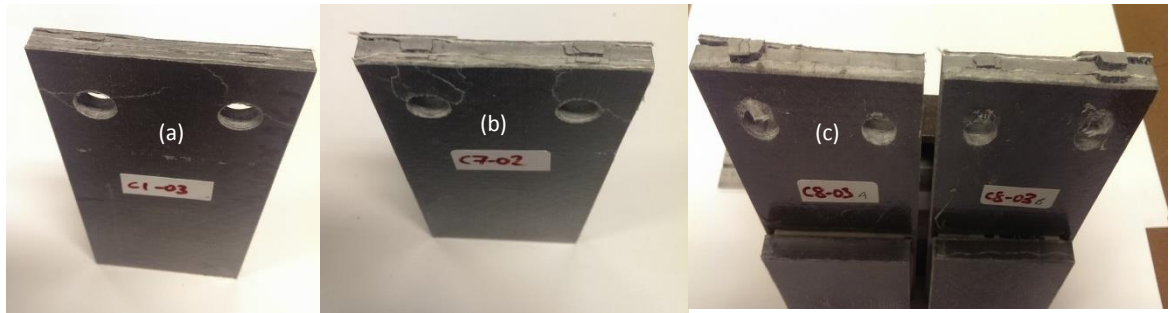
Two Bolt in a Row Failed Specimens for (a) Web DL, (b) Flange DL and (c) Flange SL
